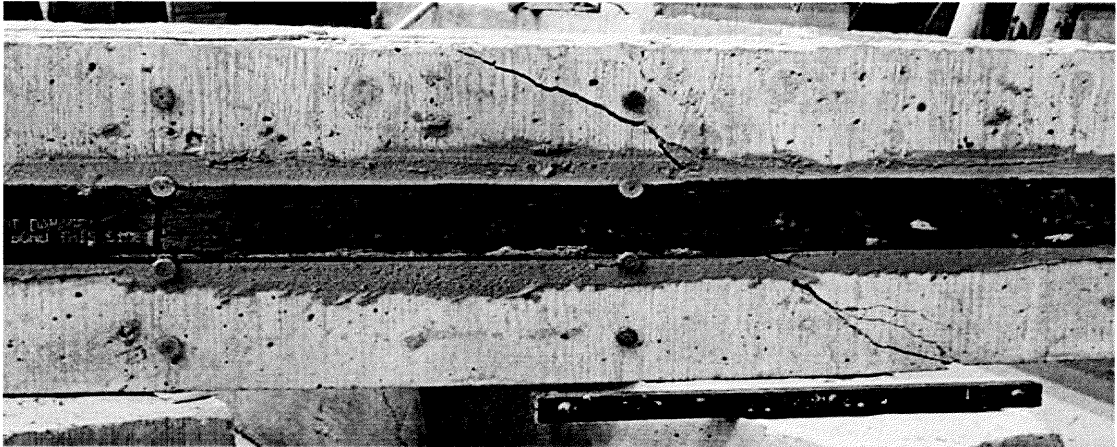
Failure of beam 1-2 with mid-strip CFRP location
